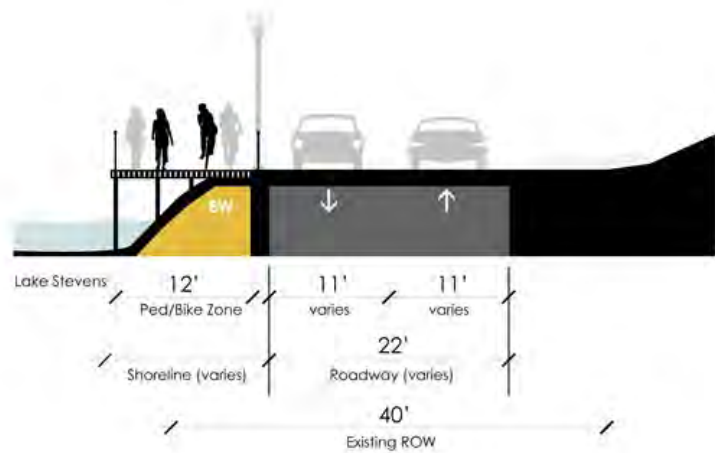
Potential Street Section: Lake-side Boardwalk
